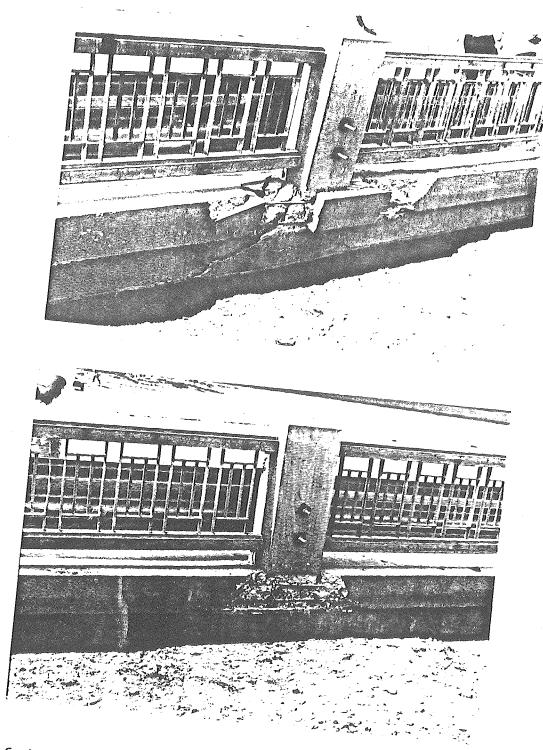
(cont). Posttest photographs of bridge rail system, test 1952-2-89.
